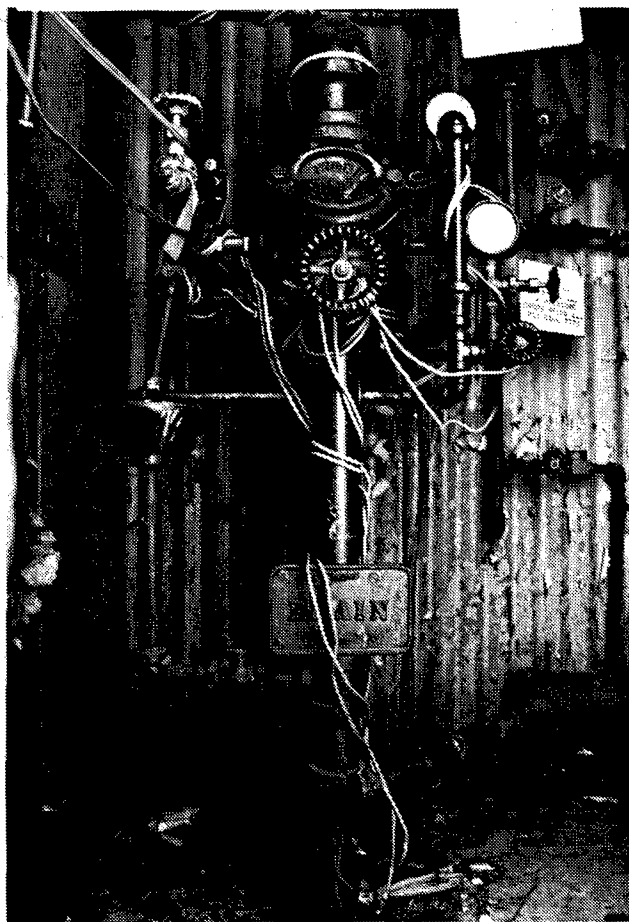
Building 1506: Sprinkler Valve Houses are a common feature on many plant structures and serve as a source of fire suppression.
